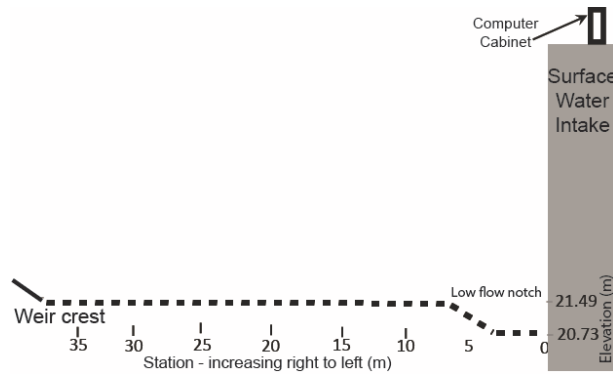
Cross section drawing (looking downstream) of the measurement weir.
